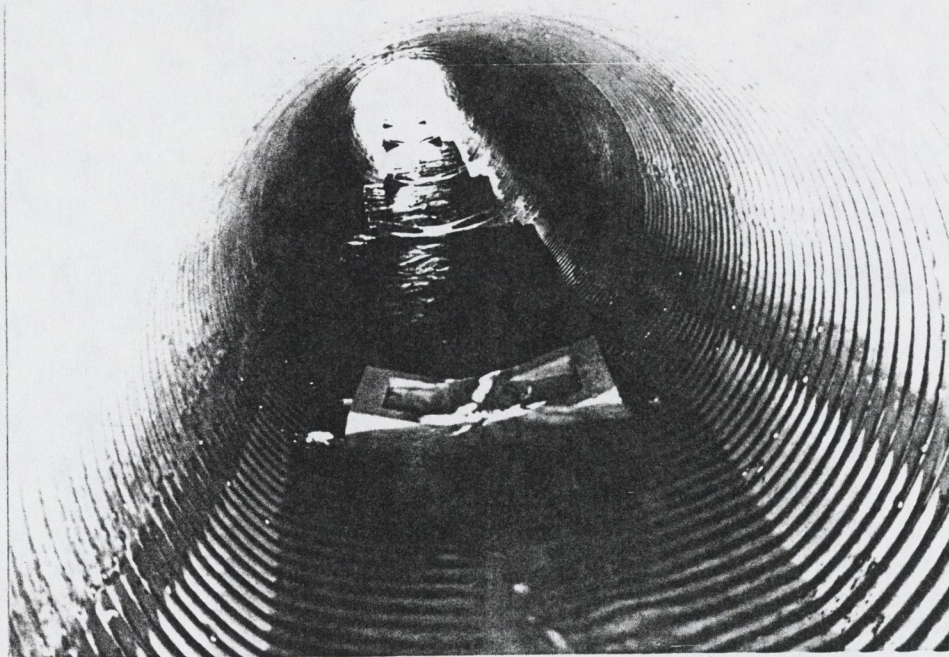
Trinity Creek Culvert - Inside View, Following Downrigger Installation
